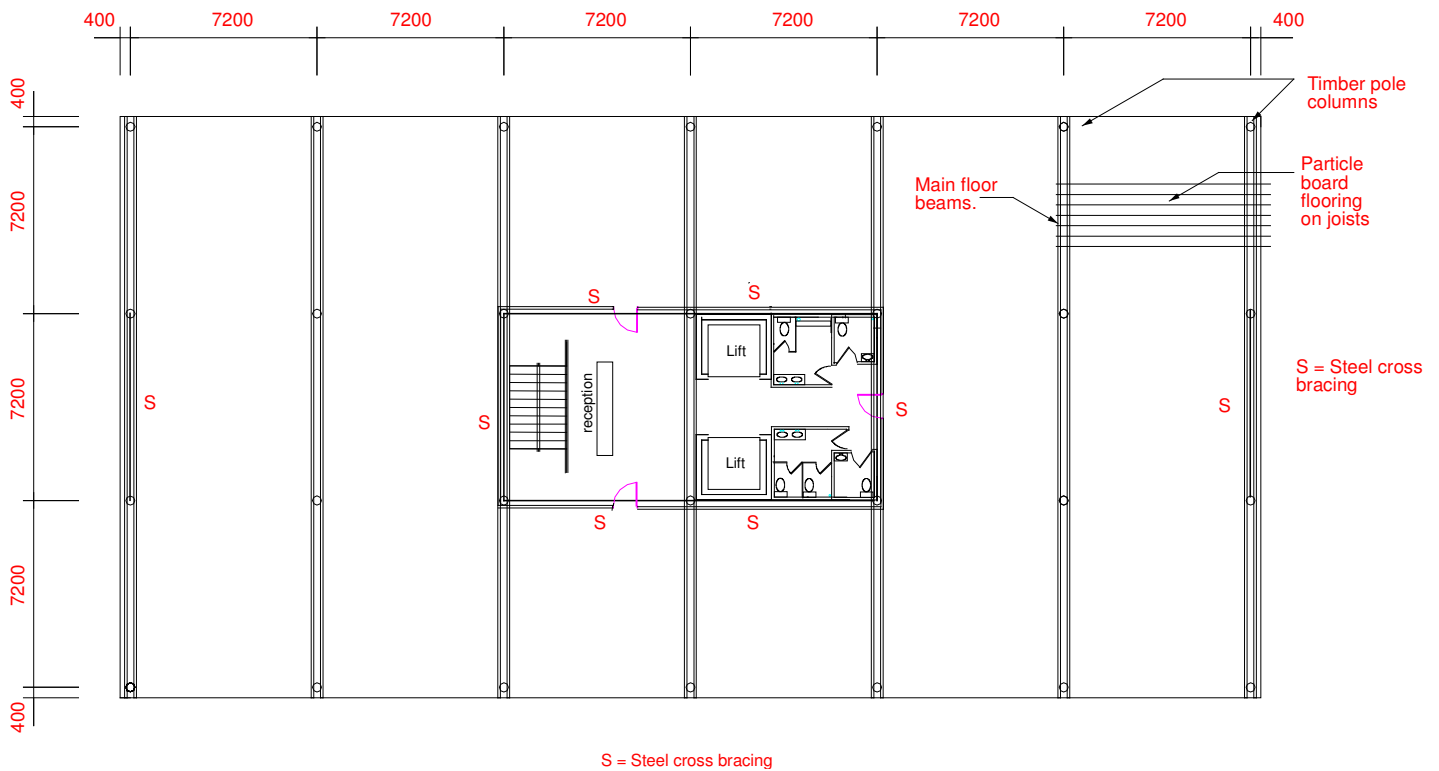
Timber Pole Multistorey Prototype Building Floor Plan
